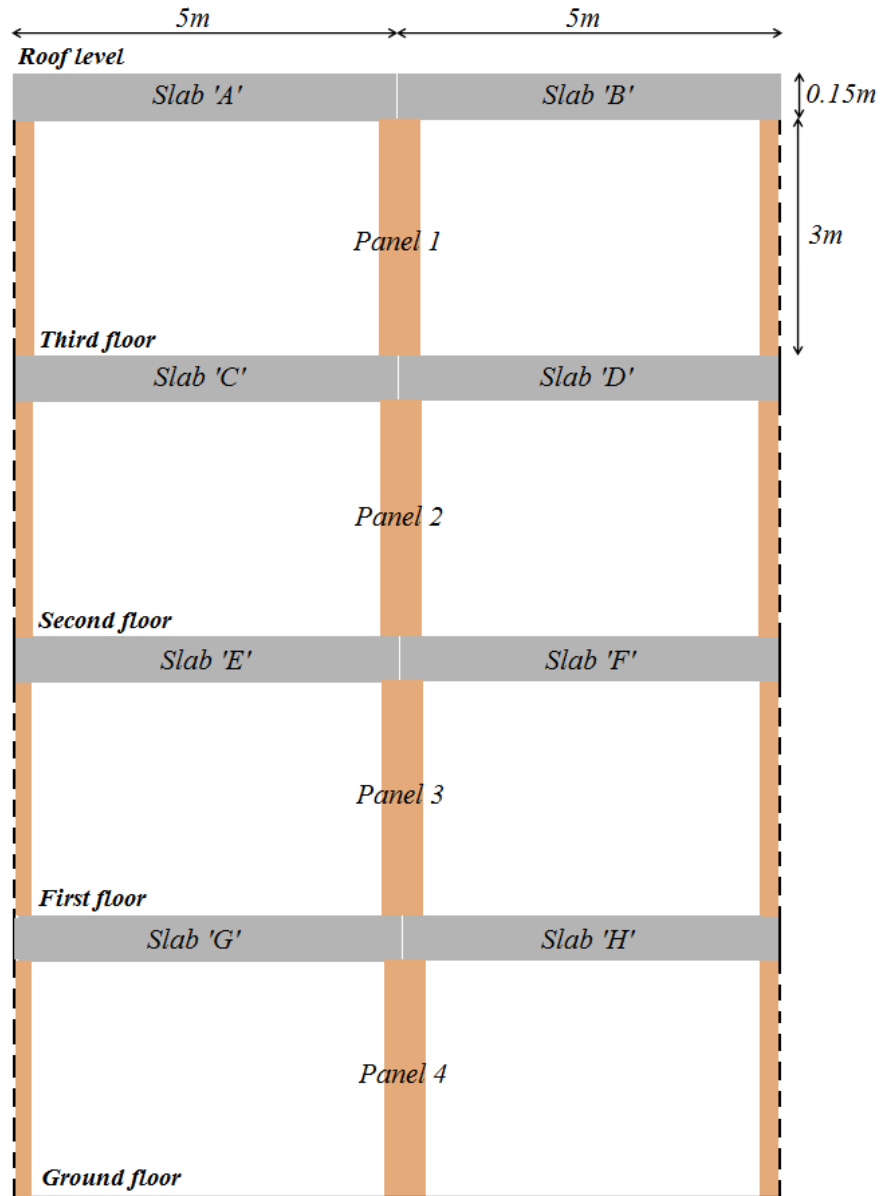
Arrangement of LFC composite wall panels for a four-storey residential building section.
